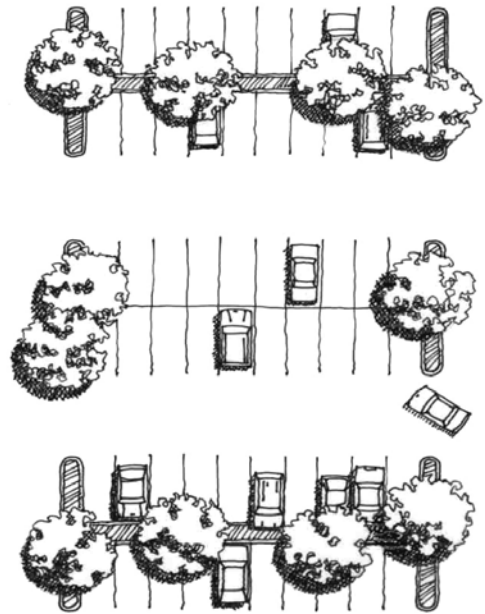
Parking blocks shall be separated from each other by landscaping, access drives or public streets, pedestrian walkways, or buildings.
